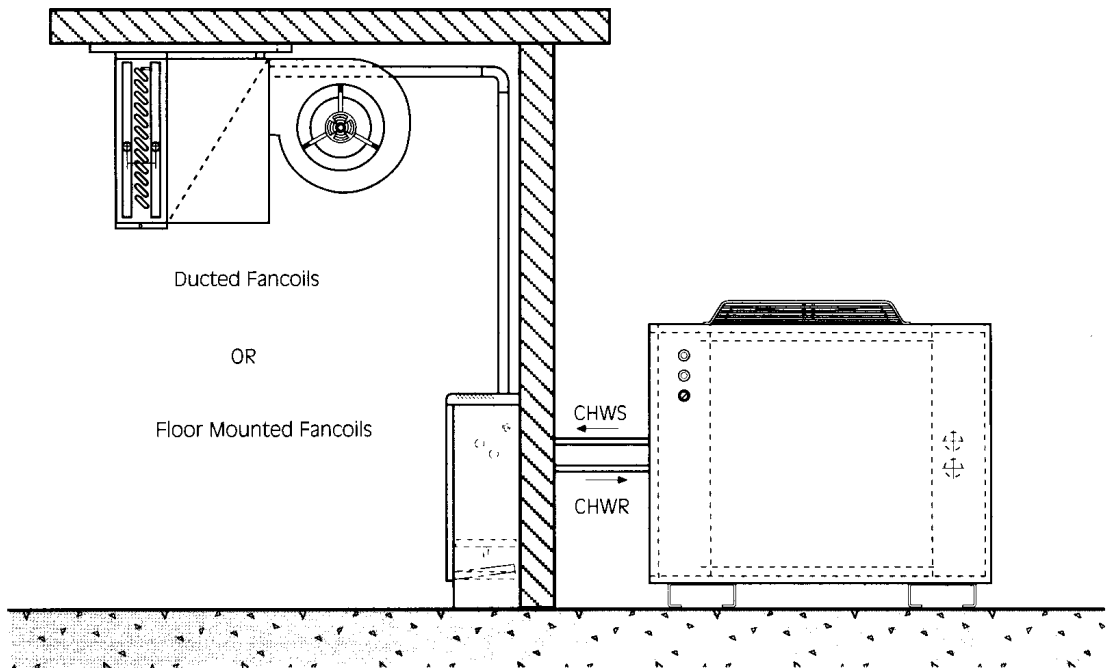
AIR COOLED PACKAGED UNIT PROPOSED INSTALLATION
